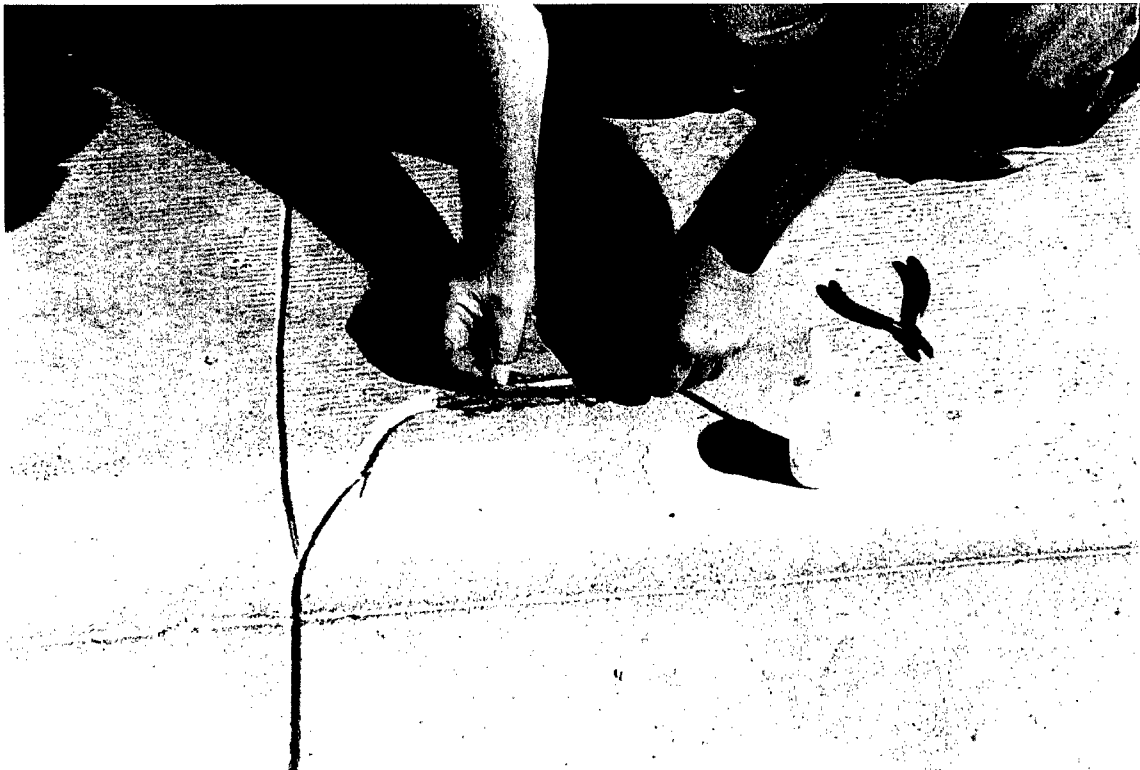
Installing Concrete Surface Gages at CDOT Project #2
